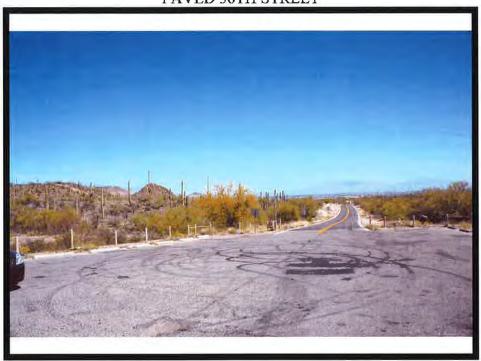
VIEW NORTH OF SR LAND IN AREA AT END OF PAVED 36TH STREET
